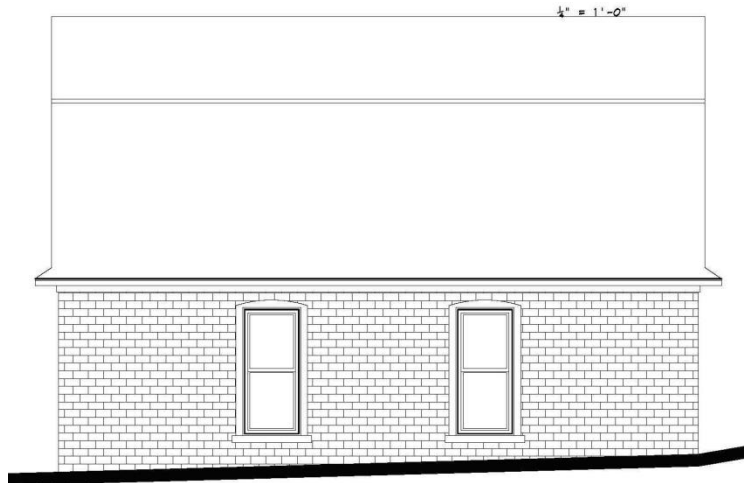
541 Highland Ave., existing north elevation, 2015.
